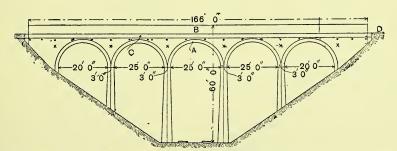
Elevation of Viaduct, showing Positions of Cantilevers for supporting Footway.
